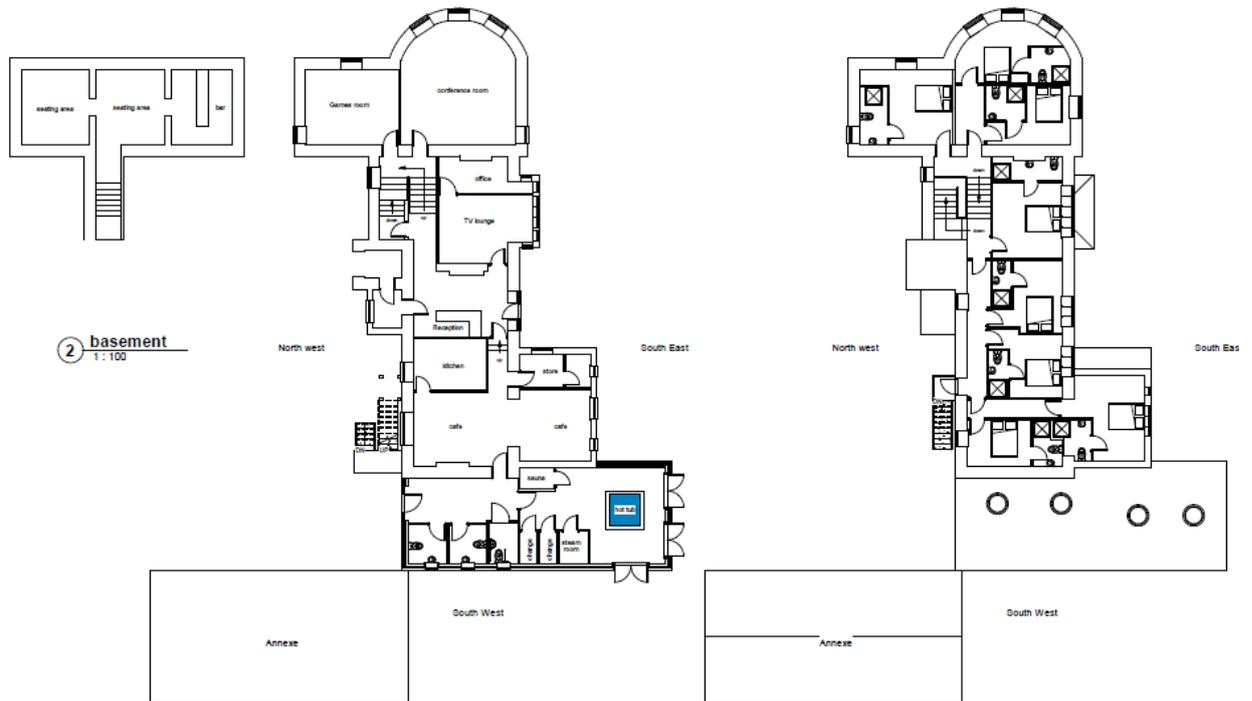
proposed floor layout of Guest rooms, café and ancillary spa.
